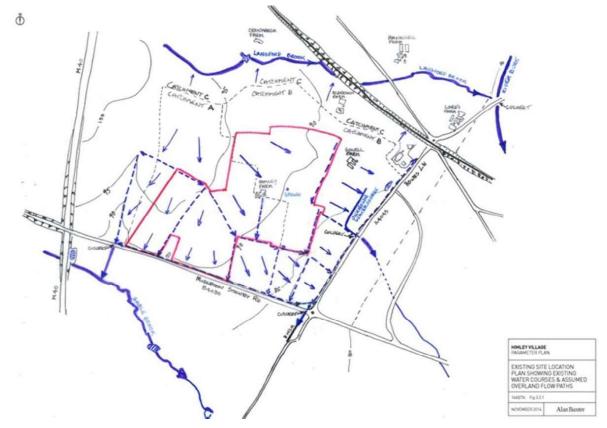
Site location plan with key drainage features (FRA report Fig. 3.3, Alan Baxter & Associates, 2014)
